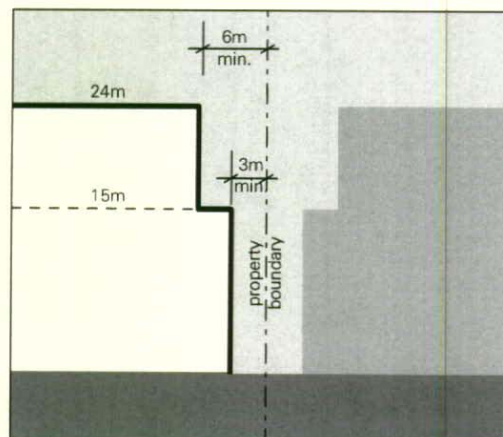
Minimum side and rear building setbacks for lower levels in special locations (as indicated in Figure 2.1). Applies south of Parkes Street and north of Victoria Road.
